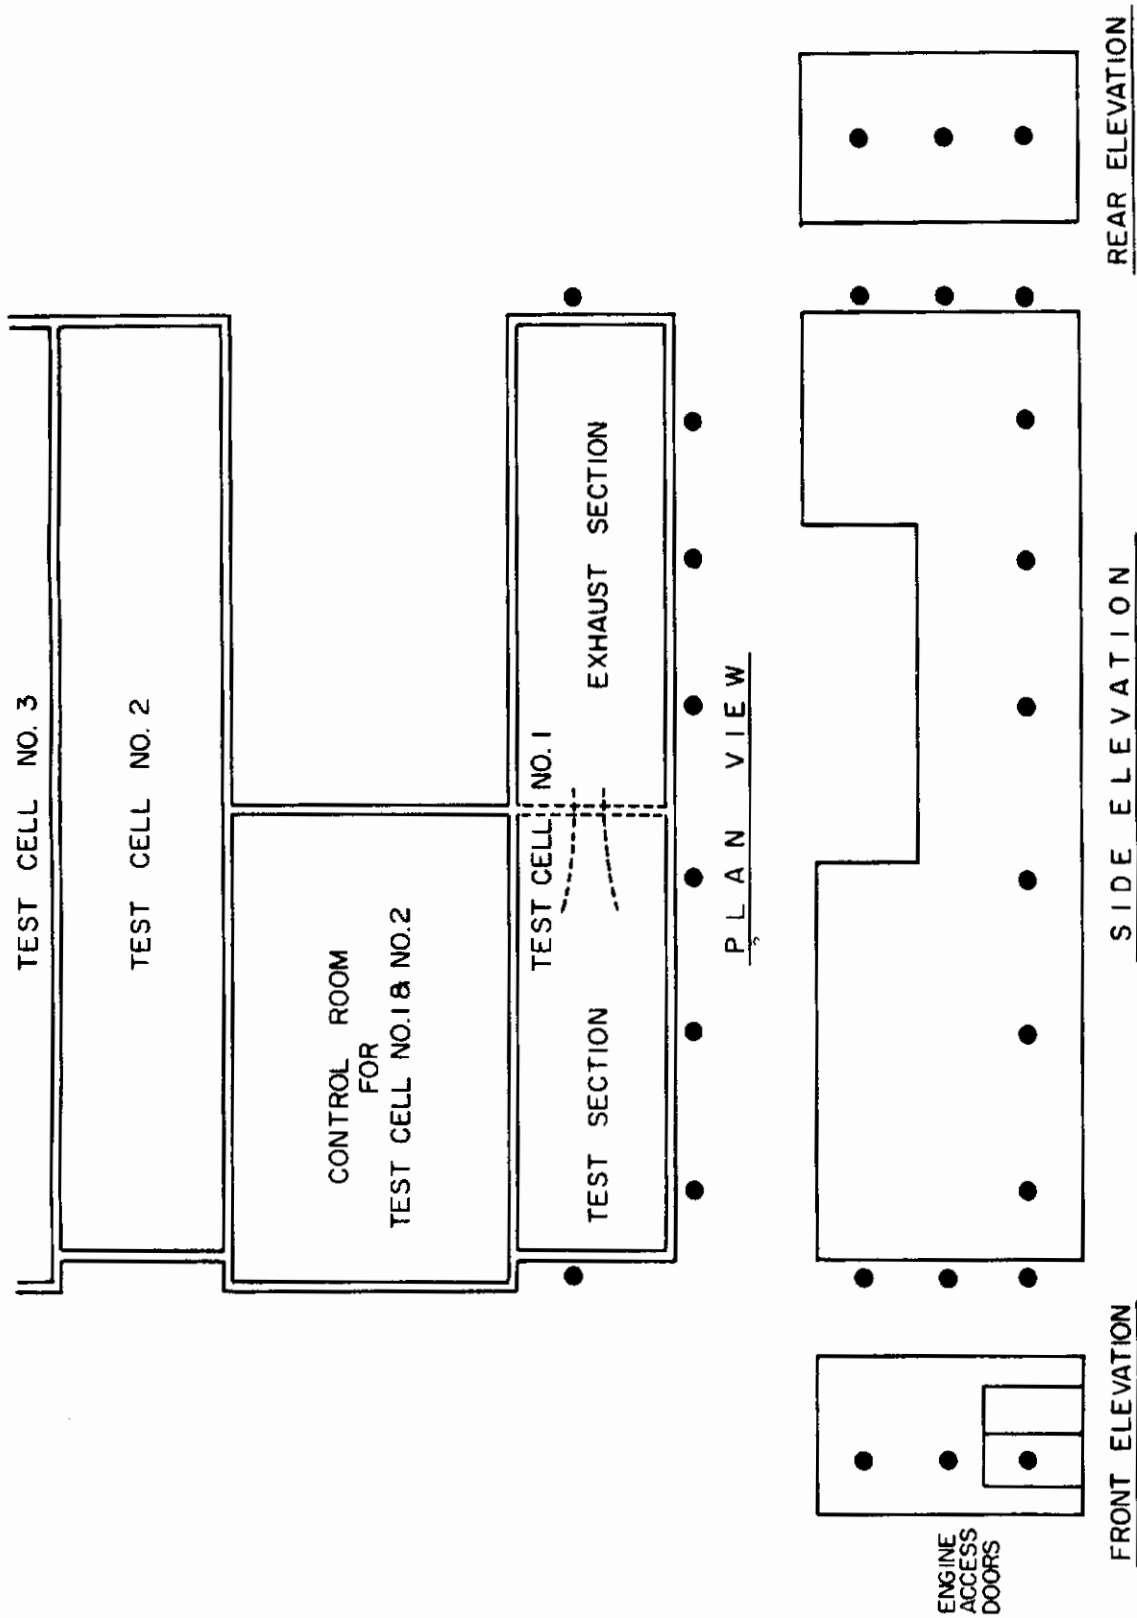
MEASUREMENT POSITIONS NEAR WALLS OF A TEST CELL.
